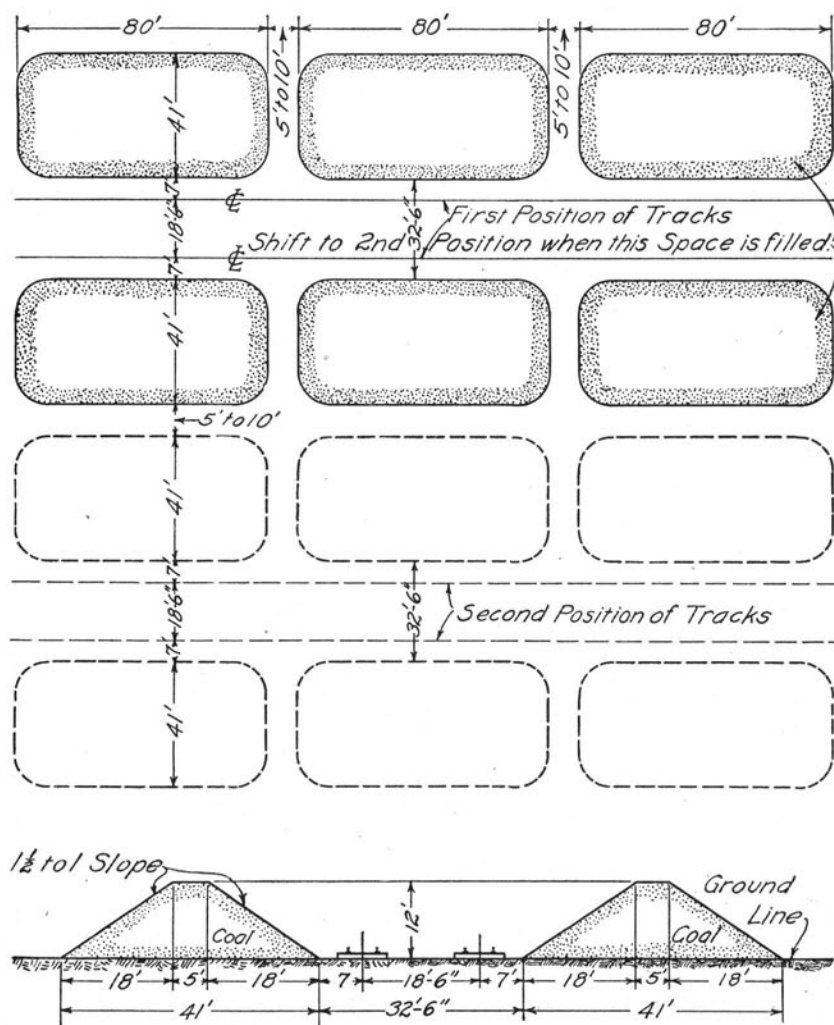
PLAN AND SECTION ILLUSTRATING STANDARD COAL STORAGE SYSTEM OF MISSOURI PACIFIC RAILROAD
